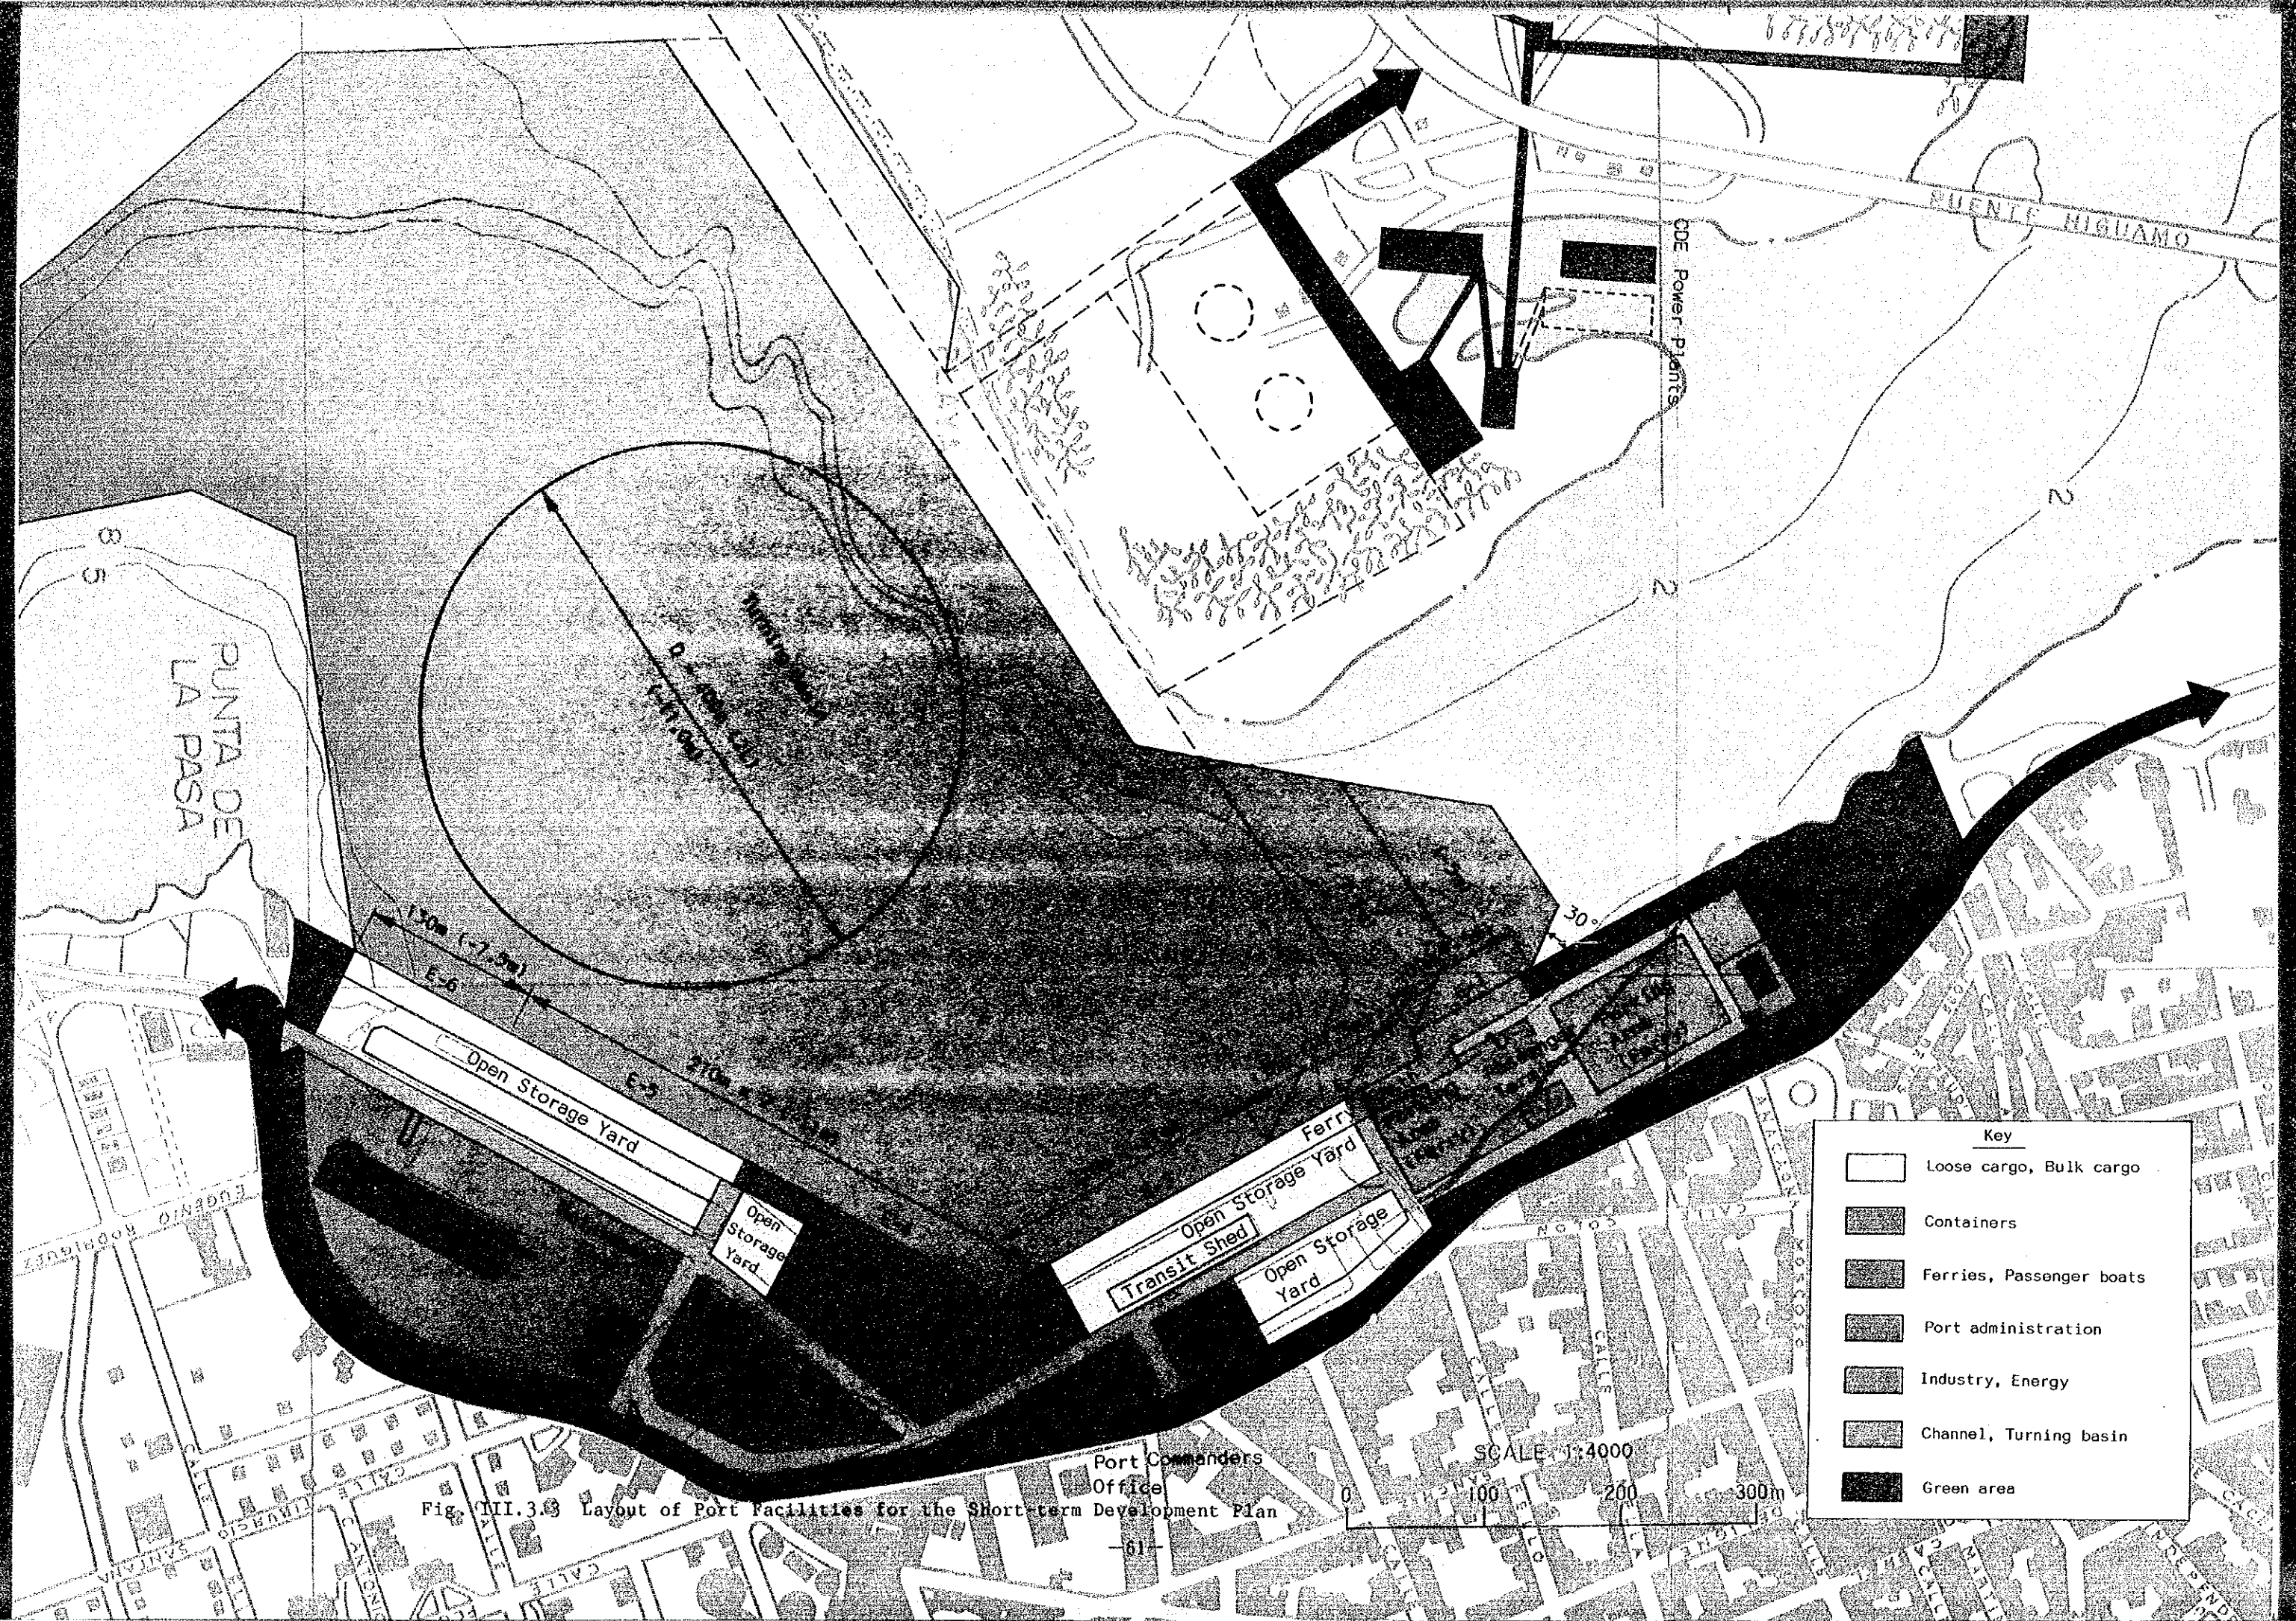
Layout of Port Facilities for the Short-term Development Plan
